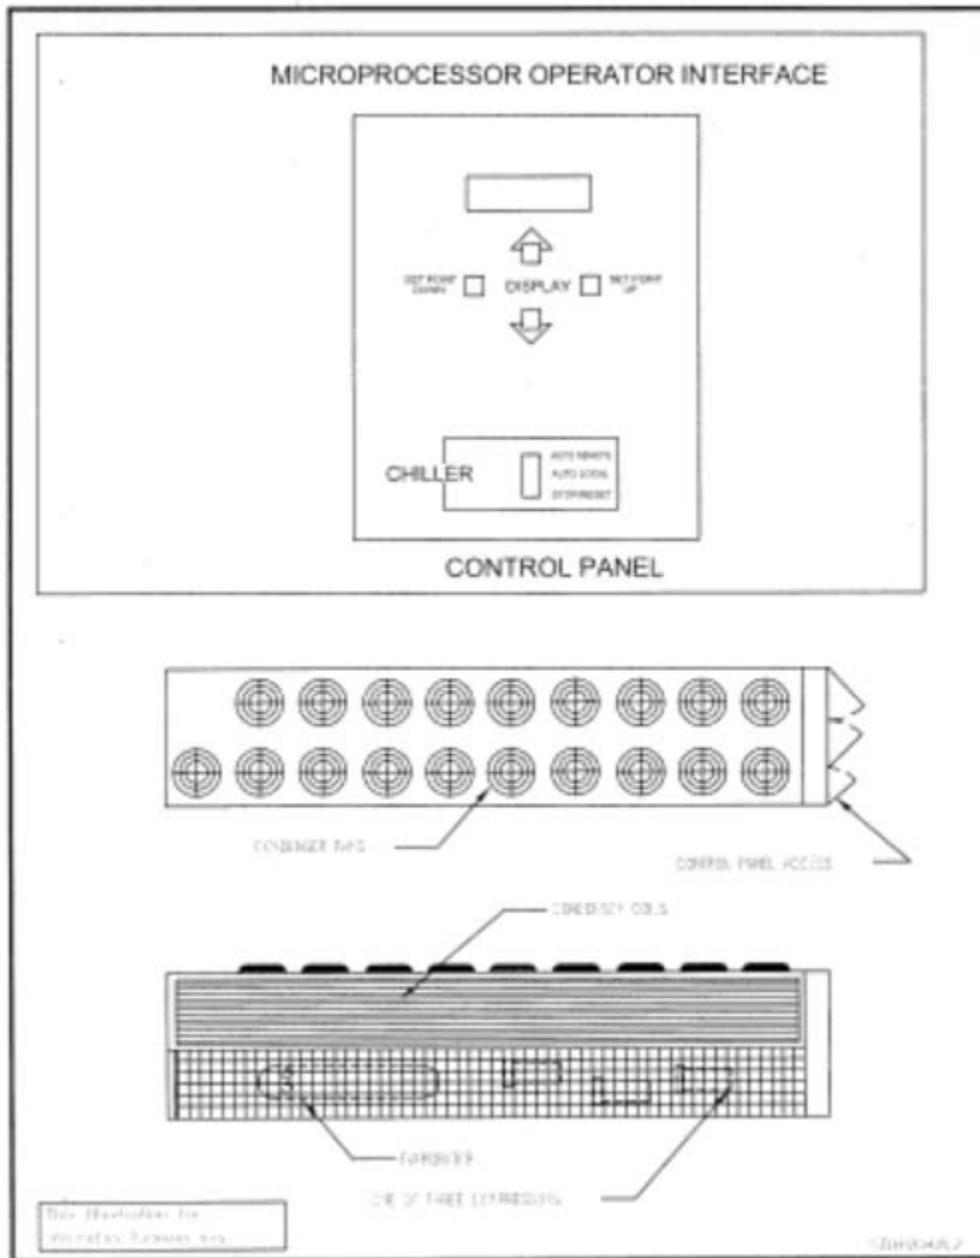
CW02 Chiller, Component Schematic and Panel Layout
